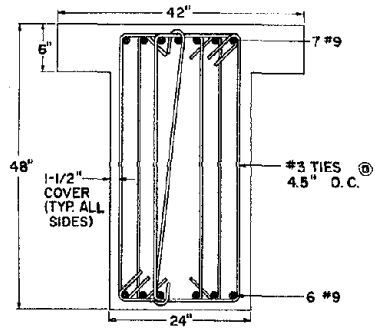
DETAILING OF GIRDER TYPE 3, UBC-73 DESIGN (GIRDER TYPE 2, UBC-79 DESIGN)
